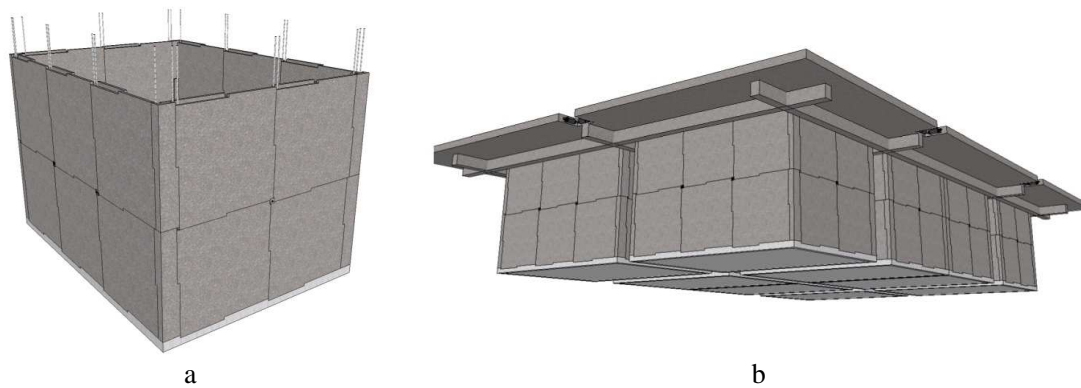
Pre-cast concrete pontoons a) Fabricated pontoon b) The whole floating system
